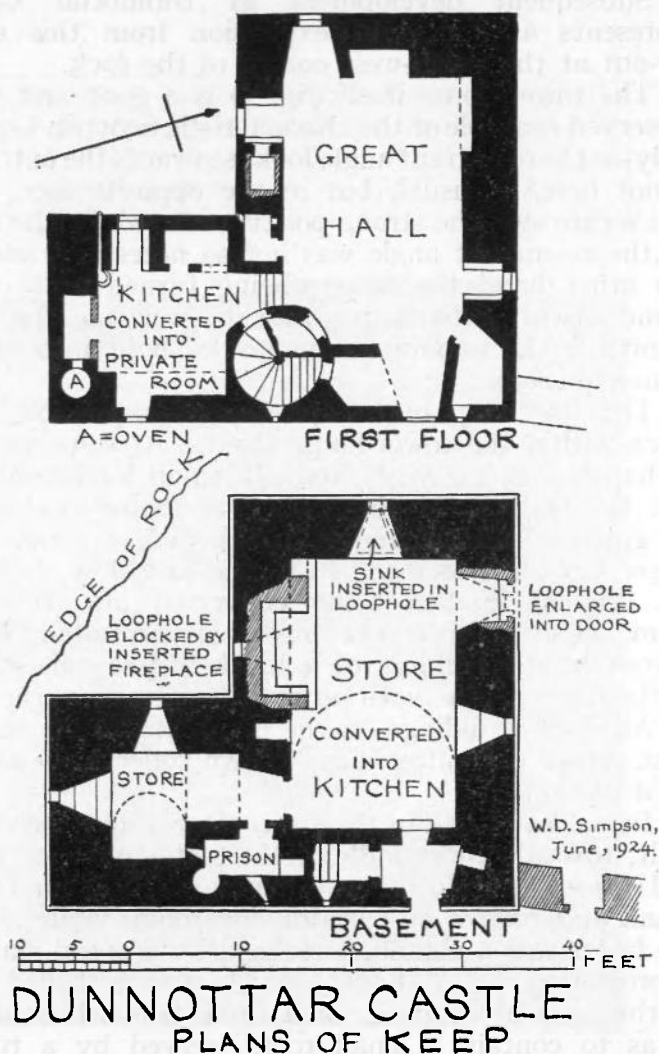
DUNNOTTAR CASTLE. PLANS OF THE GREAT TOWER
